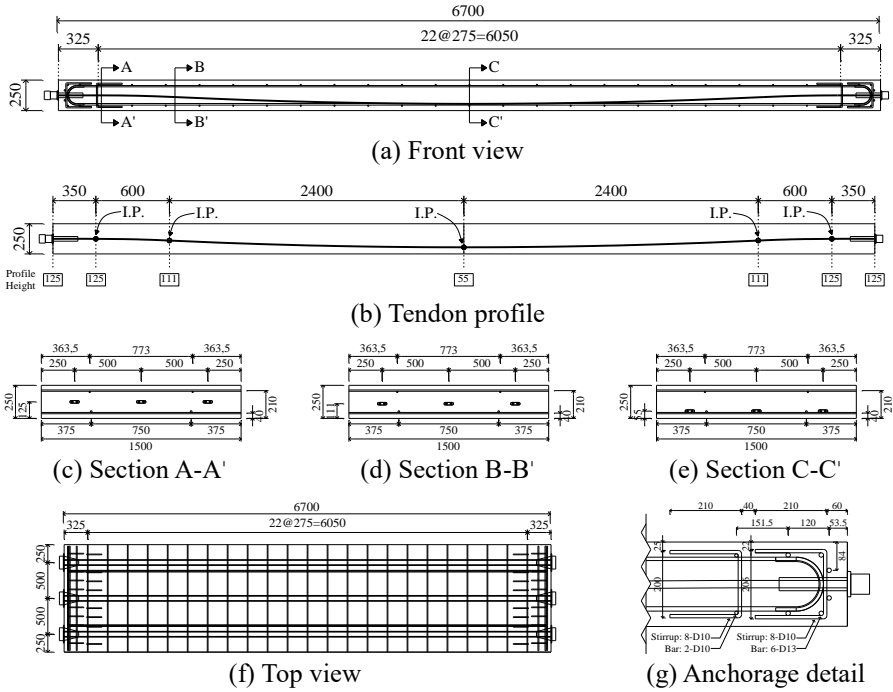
Details of Specimen PF-B2 (unit: mm)
